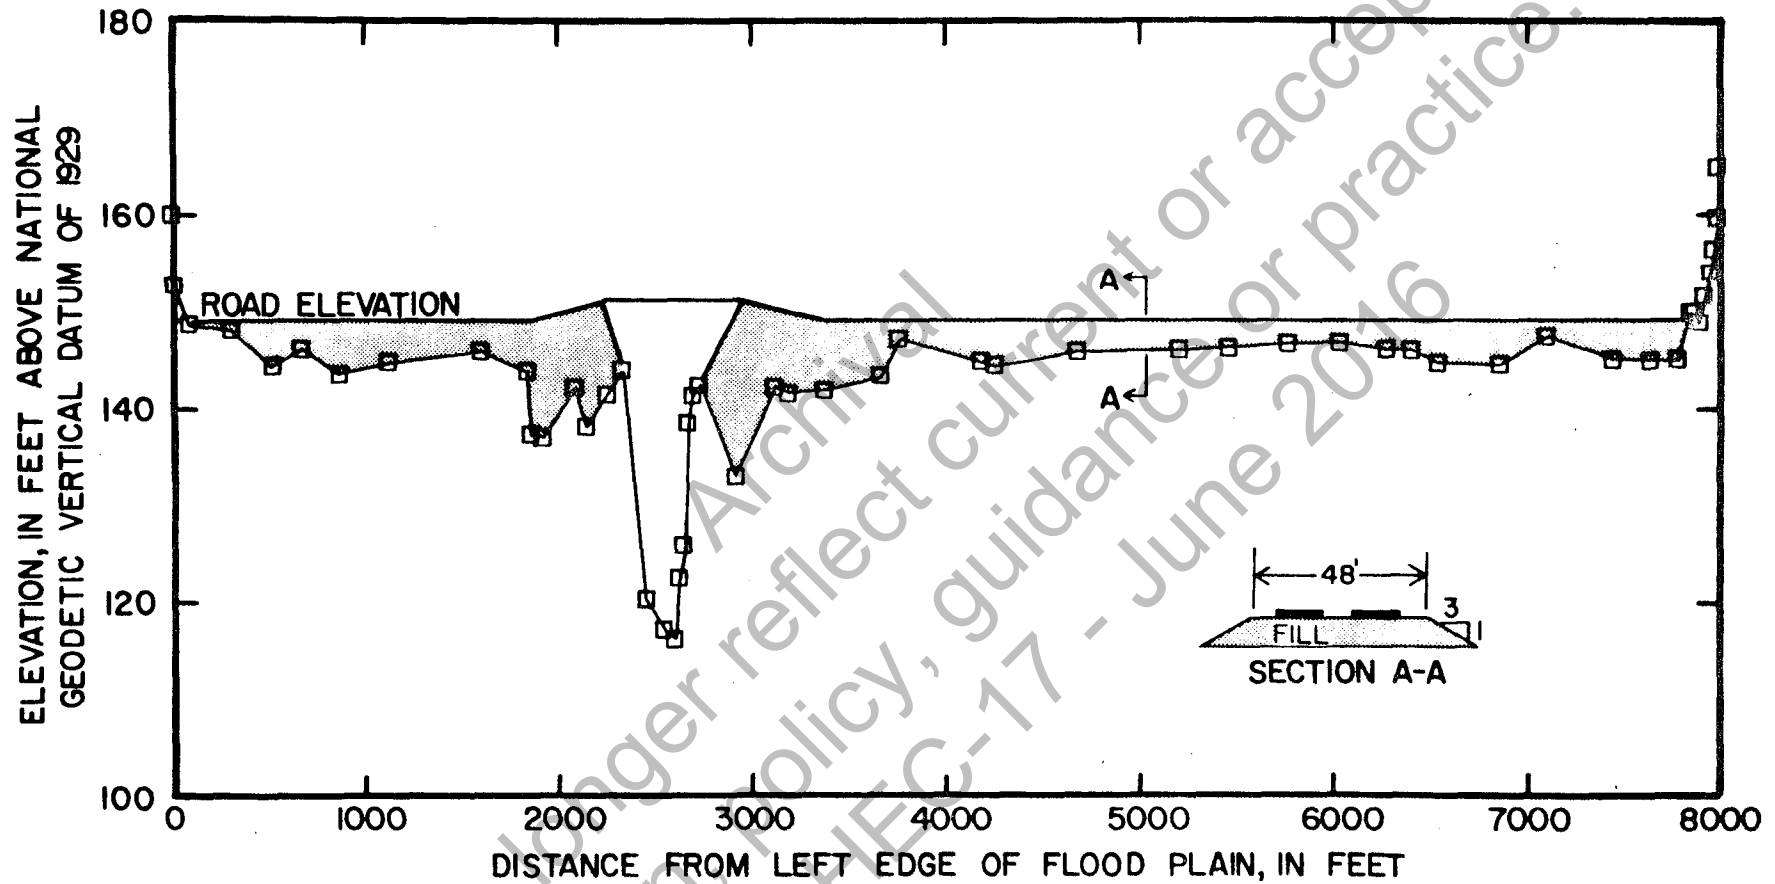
E CROSS SECTION 5 LOCATED UPSTREAM FROM THE PROPOSED U.S. HIGHWAY 11 (STATION 6480 FT) WITH A TYPICAL HIGHWAY SECTION SUPERIMPOSED
